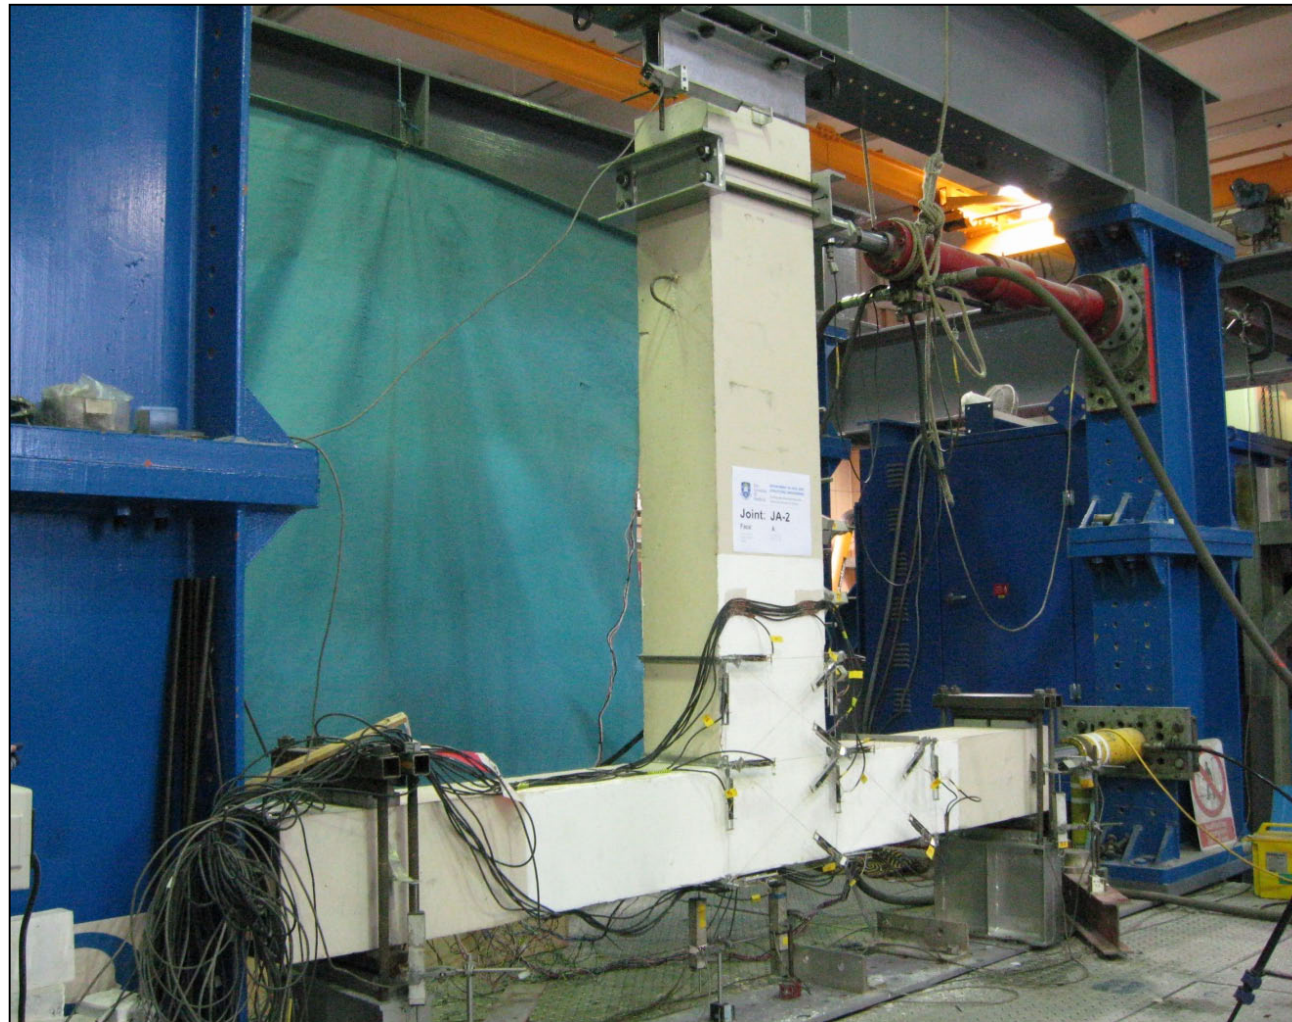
Test unit in the test rig and instrumentation installed and loading apparatus mounted
